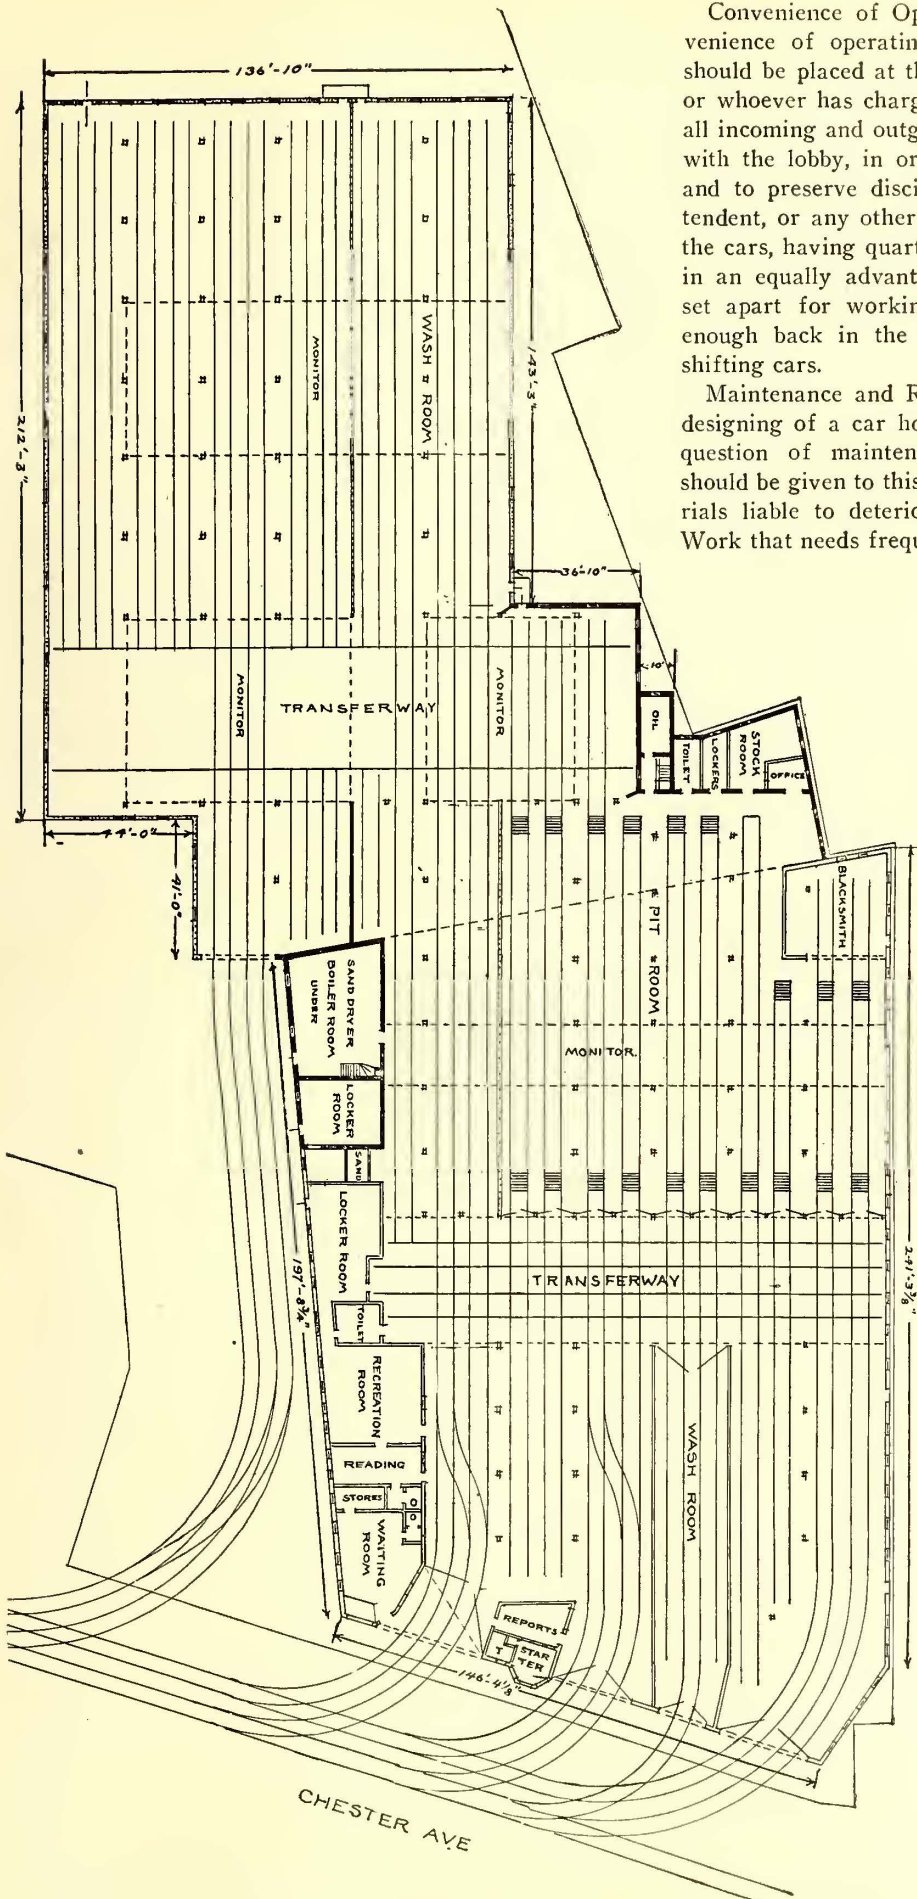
Plan of Car House, Built Parallel to and on Street Line. Transverse Pits and Blacksmith's Shop at End of Track
